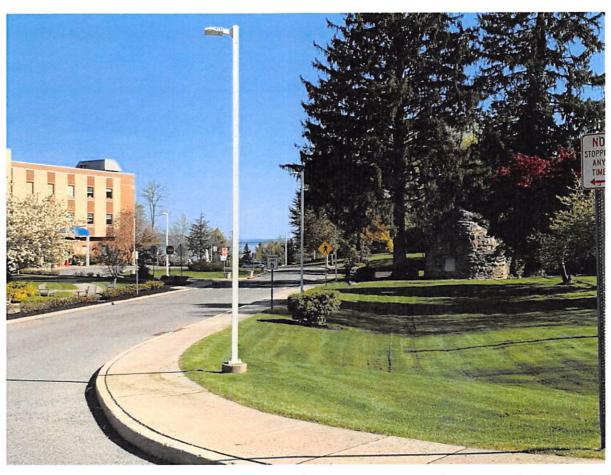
Potential alternative area along main driveway to accommodate perpendicular parking (walkway would have to be relocated behind parking stalls (view looking north)
